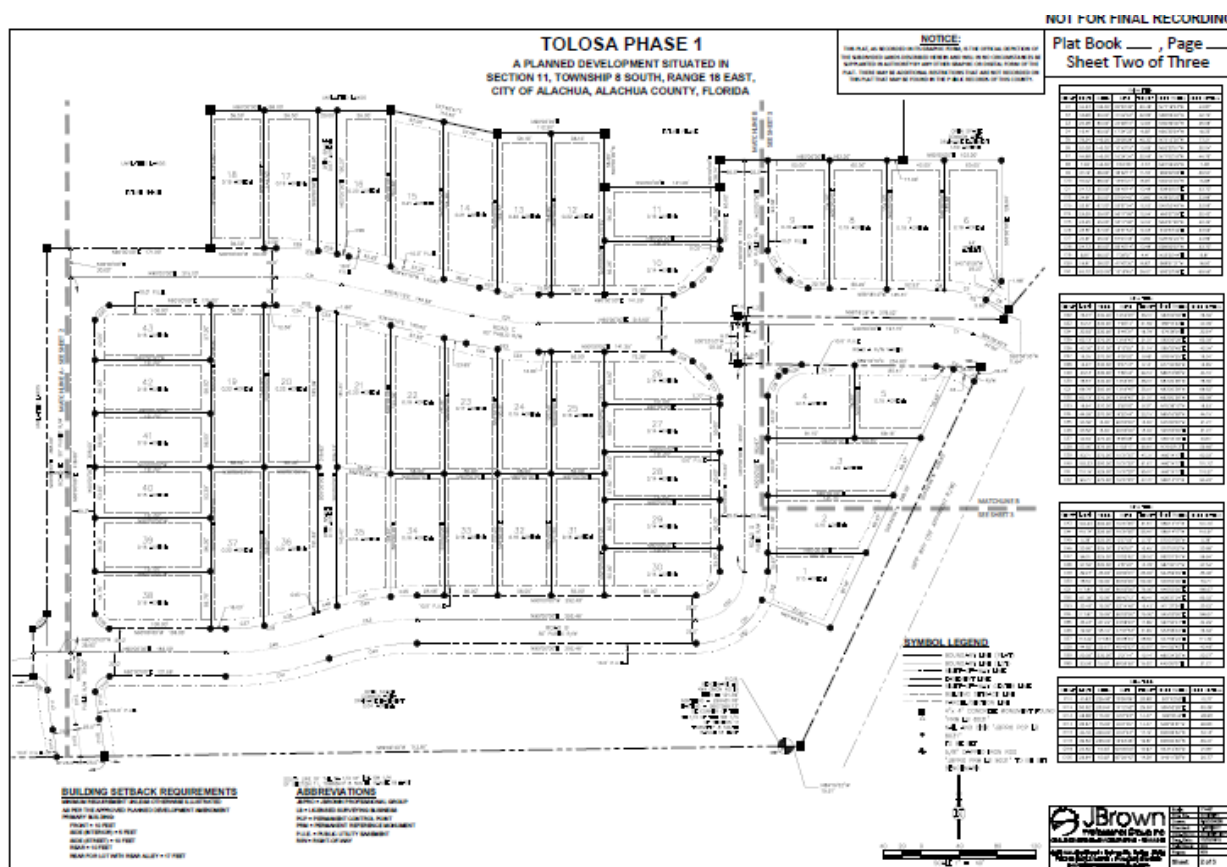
Overall Site Plan for Tolosa PD-R Phase 1 Subdivision
